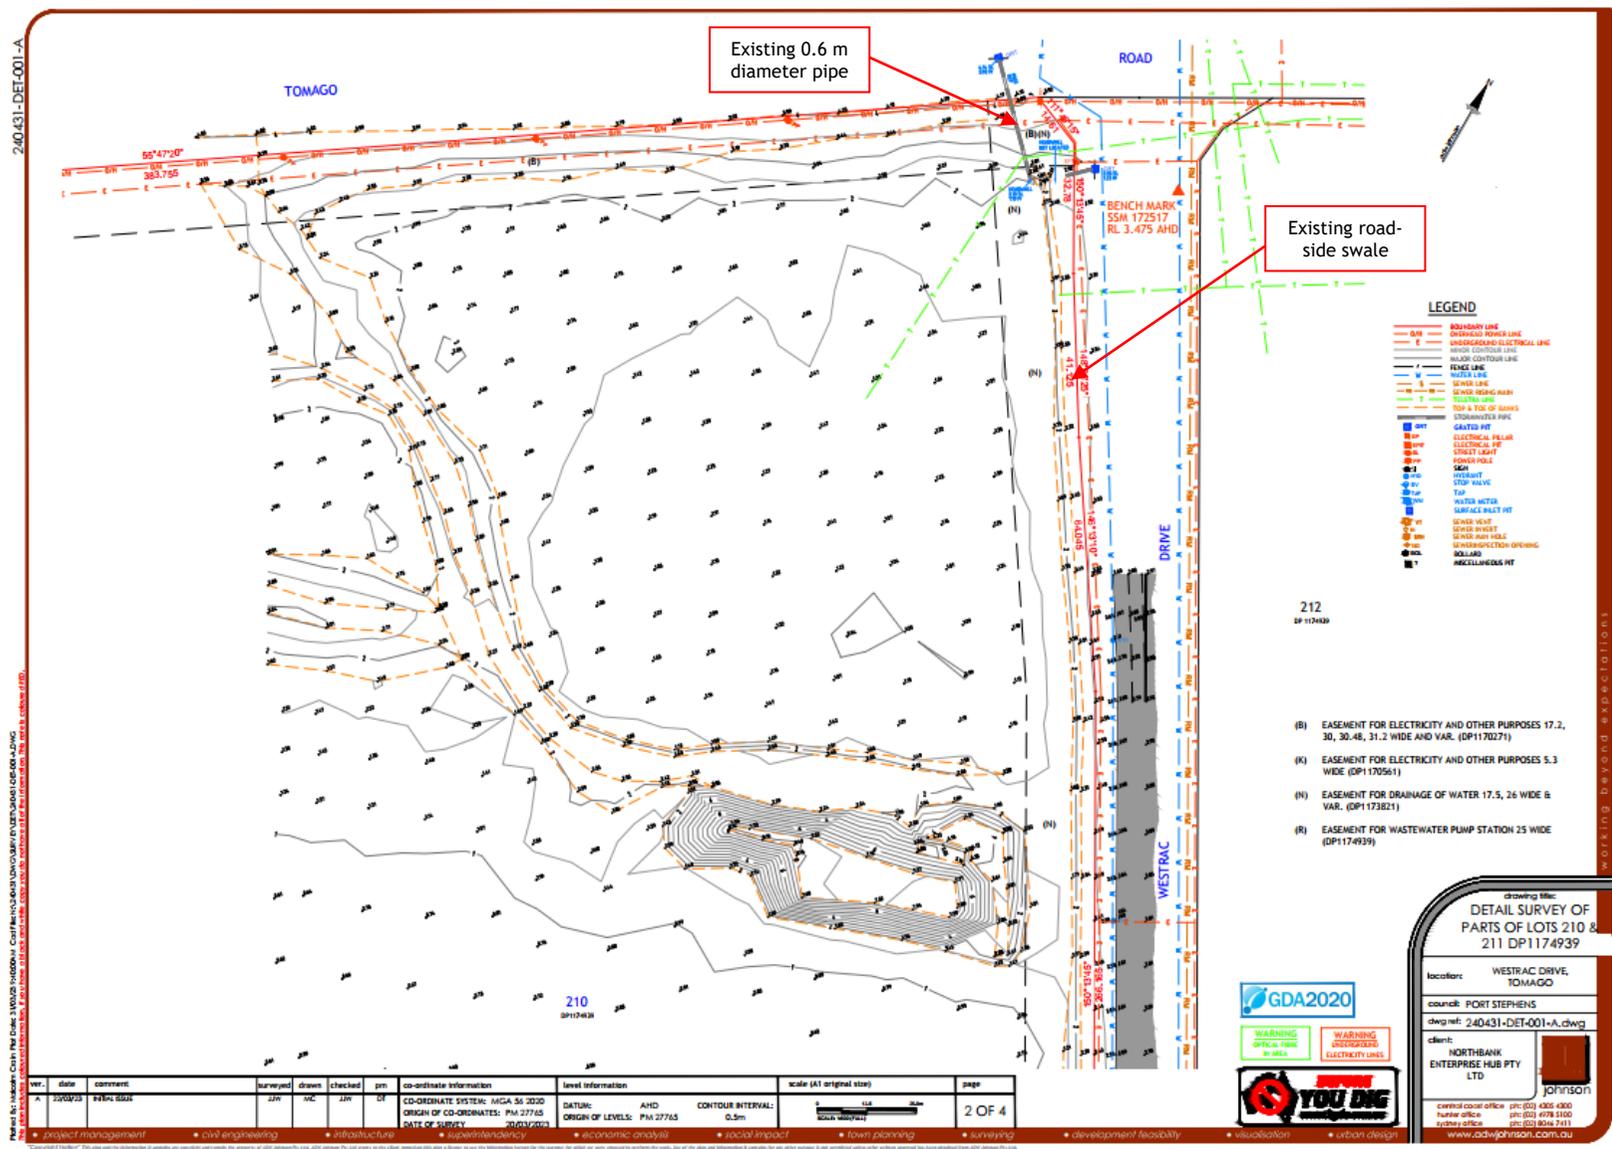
Ground survey for the northeastern section of the development site adjacent to Westrac Drive
